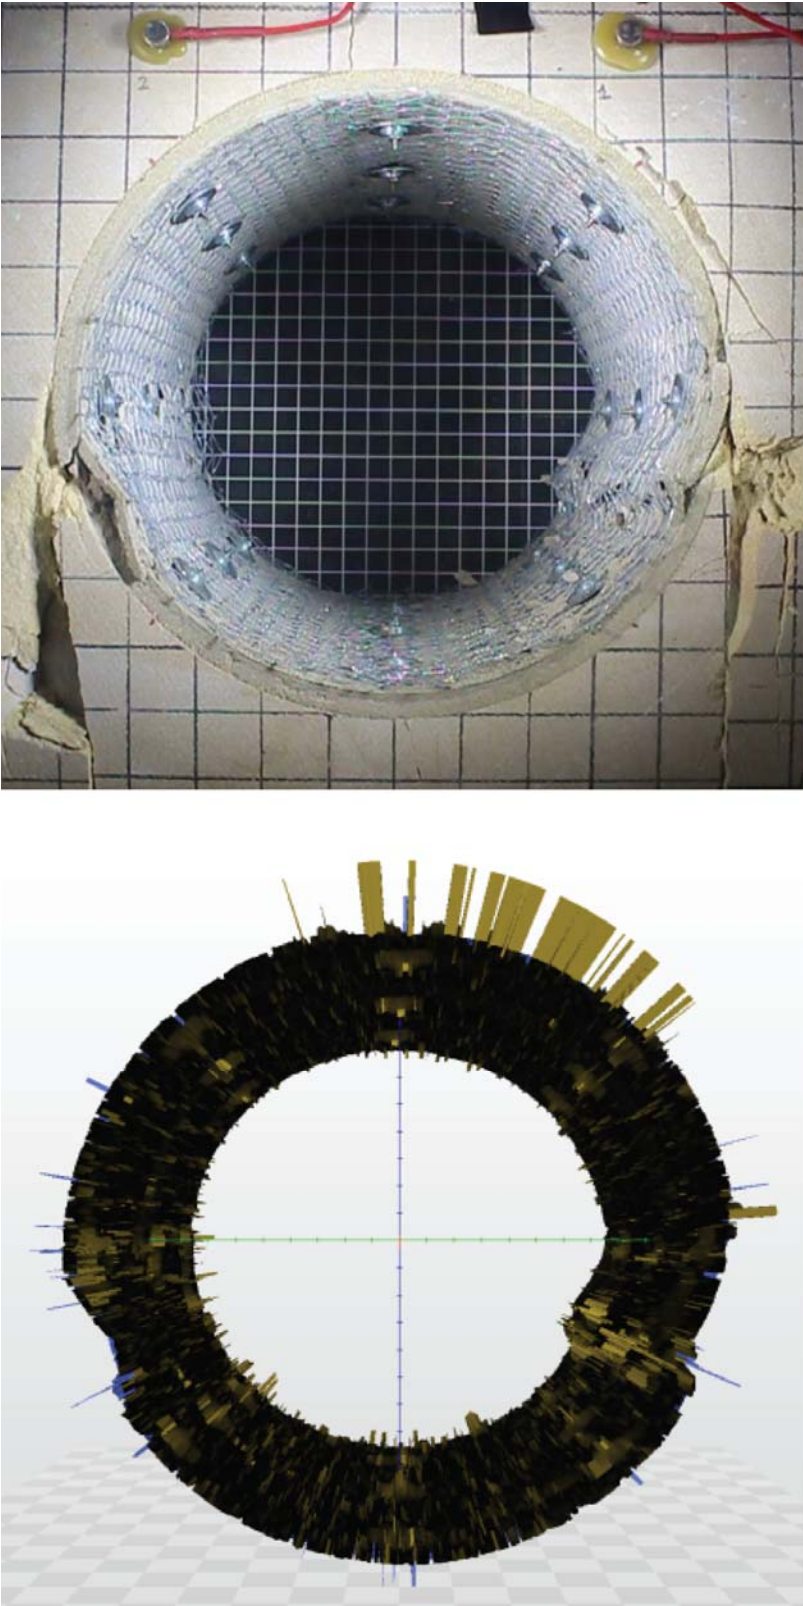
Comparison of 3D view and excavation surface after failure of Specimen No.15.
